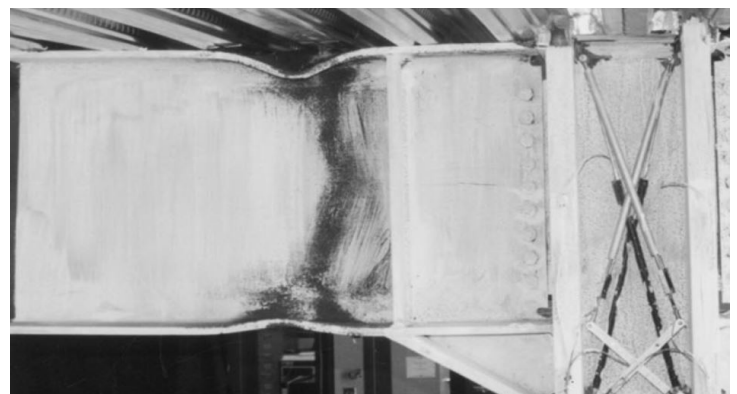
Experimental testing of welded bottom haunch retrofit (Uang et al. 2000)
